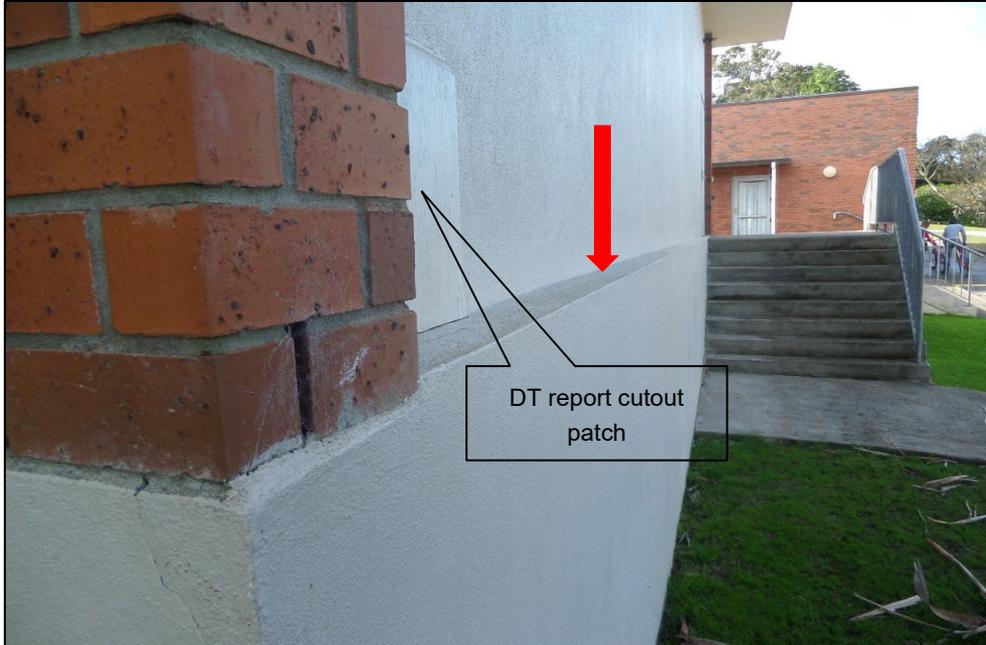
North elevation. General view of typical junction between stucco cladding and external plinth where DT report shows weather-tightness failure has occurred (refer next photo).
